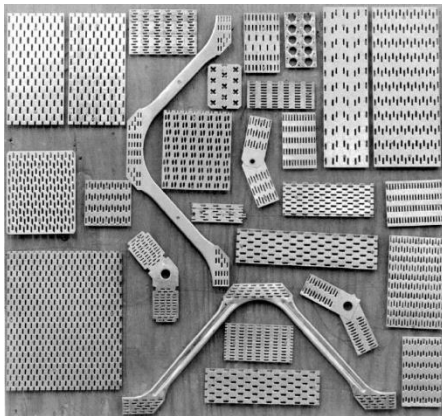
Common Metal Connector Plates used in Trussed Timber Structures (itw.com, 2019)
